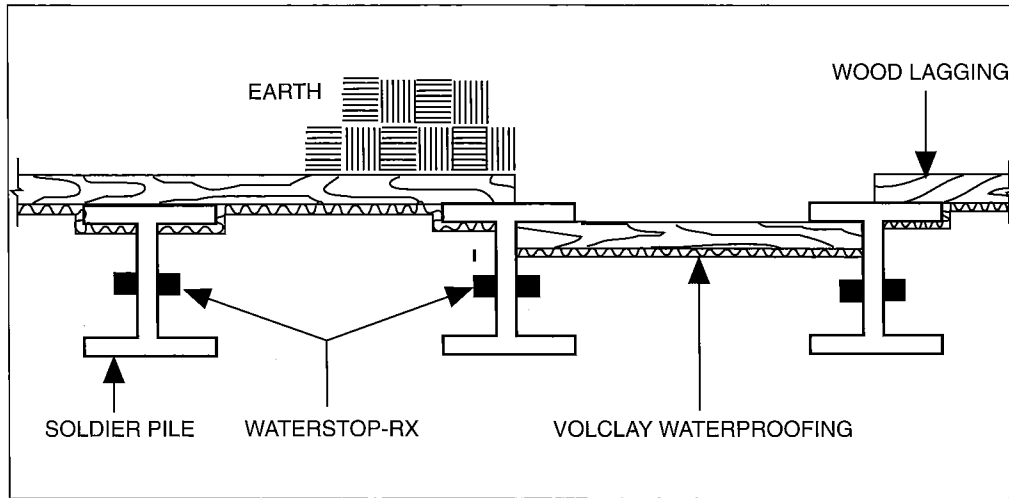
Waterstop-RX installed when wood lagging is positioned outside the soldier piles or adjacent to piles outer flange
